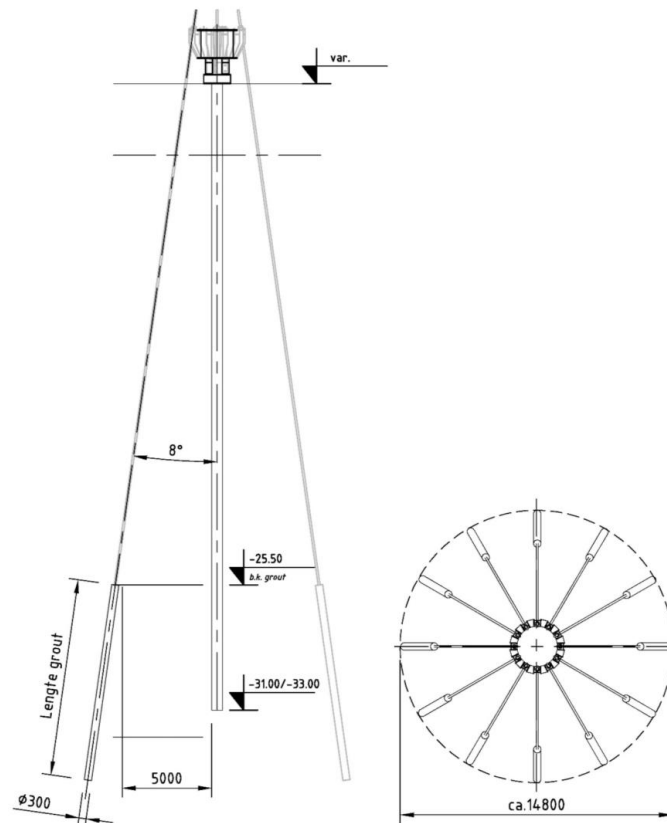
Schematic of the grout anchor design in both elevation (left) and plan view (right)
